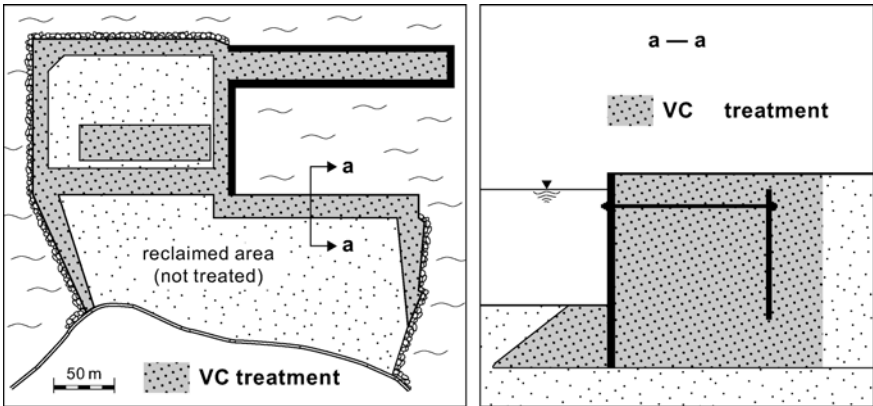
Plan of quay walls and breakwater with treatment area and cross-section through quay wall (by courtesy of Keller Group plc)
